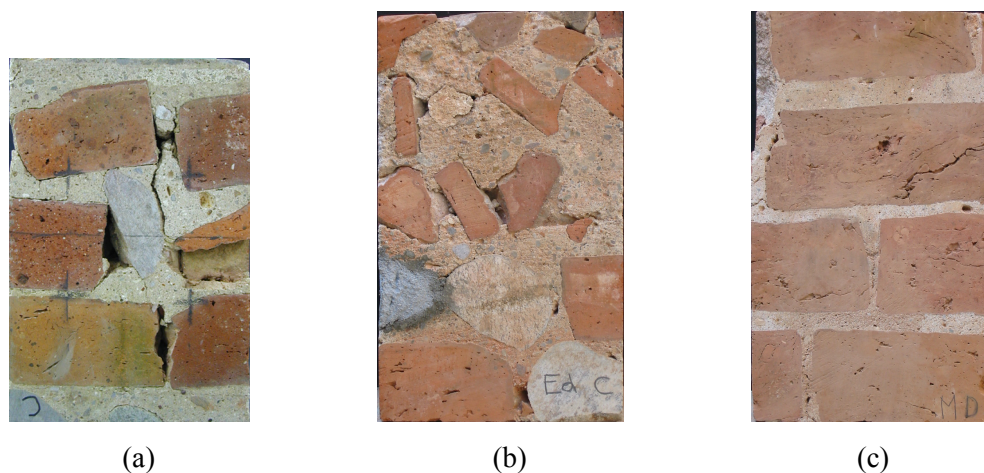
Tested prisms: (a) *MRu* specimens, (b) *PRu* specimens and (c) *PRe* specimens.
